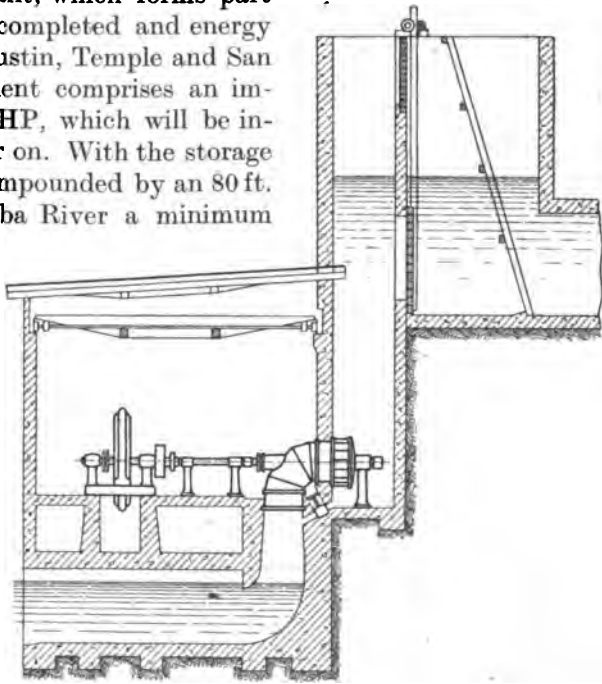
Bulkhead Flume and Cross-Section of Power House. Erindale Power Company.
